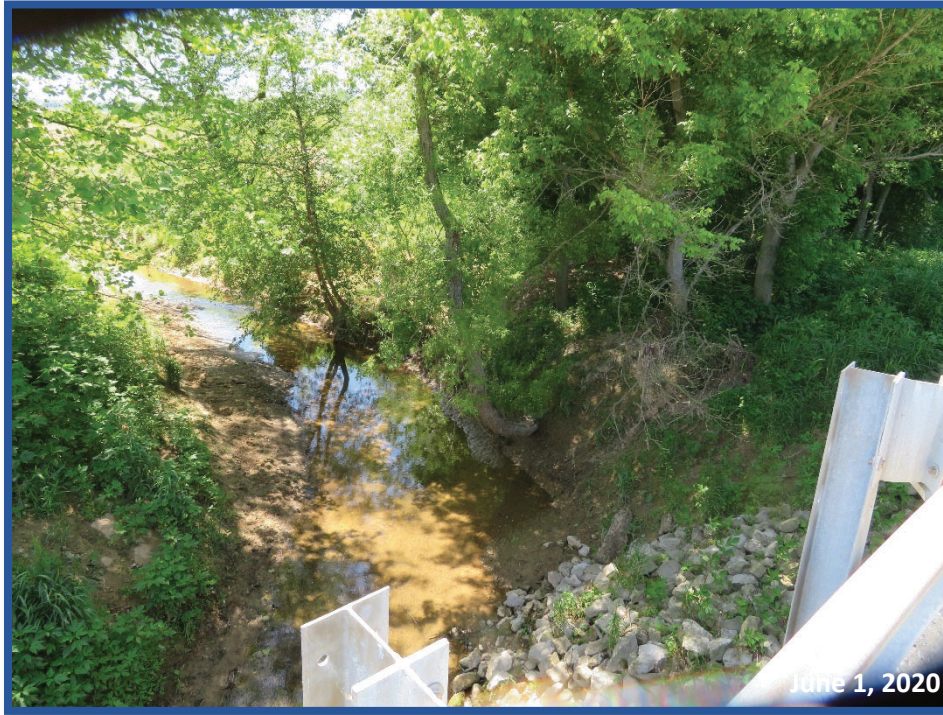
Looking southeast (upstream) along Buckhorn Creek from Bridge No. 62-74-06164 B.
